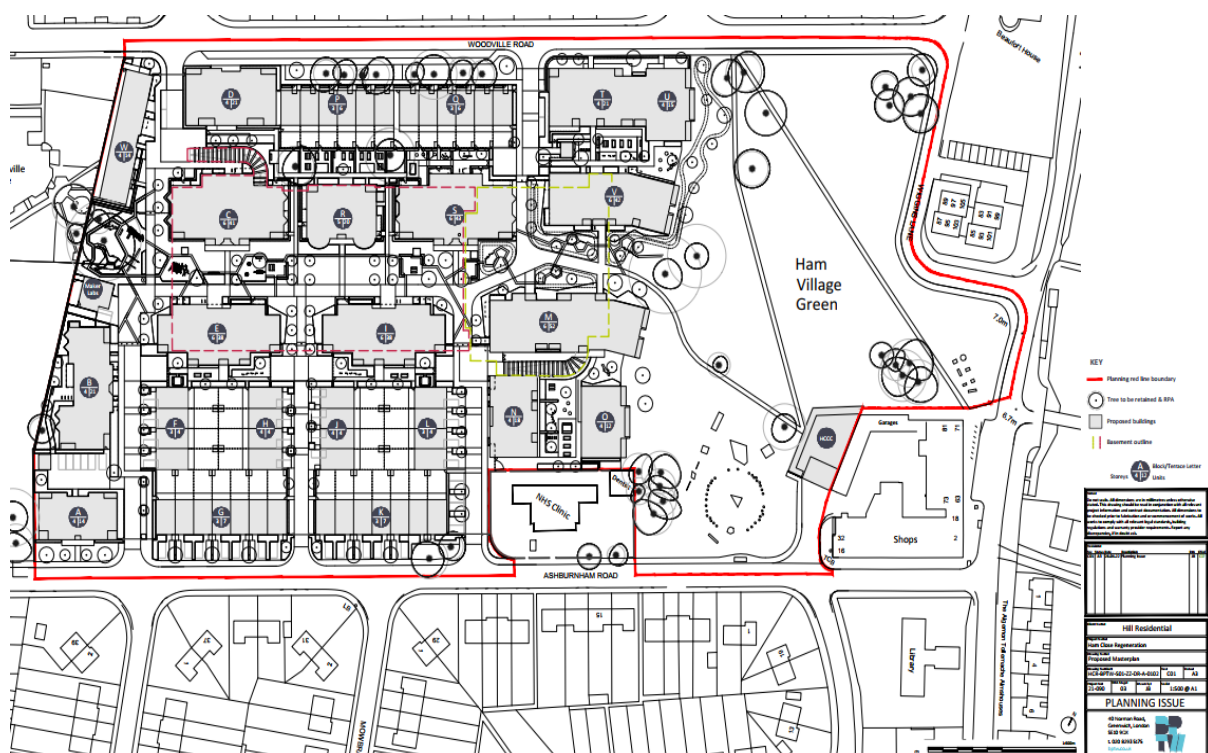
Masterplan providing an overview of the site layout (BPTW drawing HCR-BPTW-S01-ZZ-DR-A-0102-C01)
